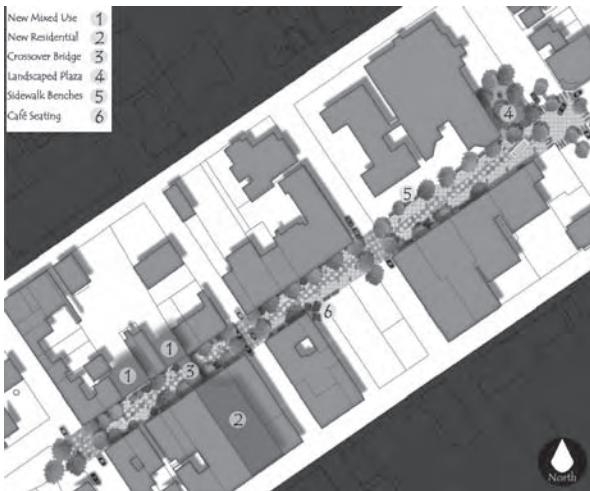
Plan view of the final design for Lower Monterey Street, showing the dedicated trolley lane designated by a difference in paving. Note the distinctly paved intersections at cross streets, the plaza on the corner of Monterey Street and Santa Rosa Street, and the street furniture along the corridor that include benches and table seating.
